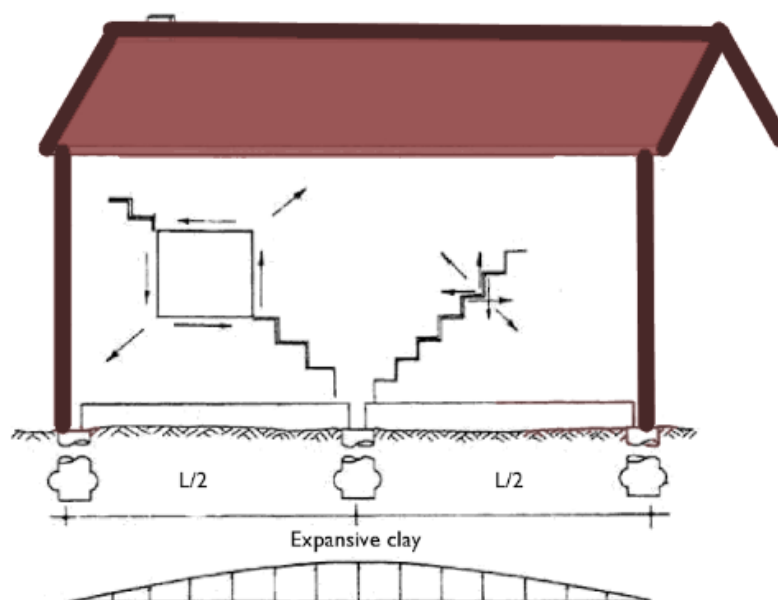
Structure subjected to center column heave (differential heave) (After [32])
